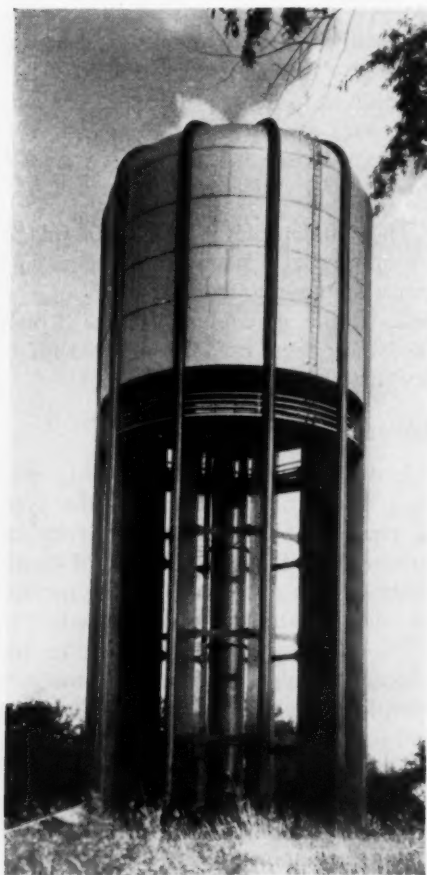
Prize-Winning Design Utilizing Vertical Pilasters
